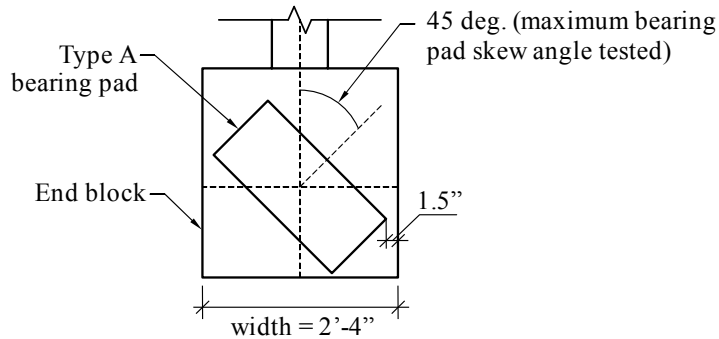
End block width, controlled by bearing pad size and skew angle
